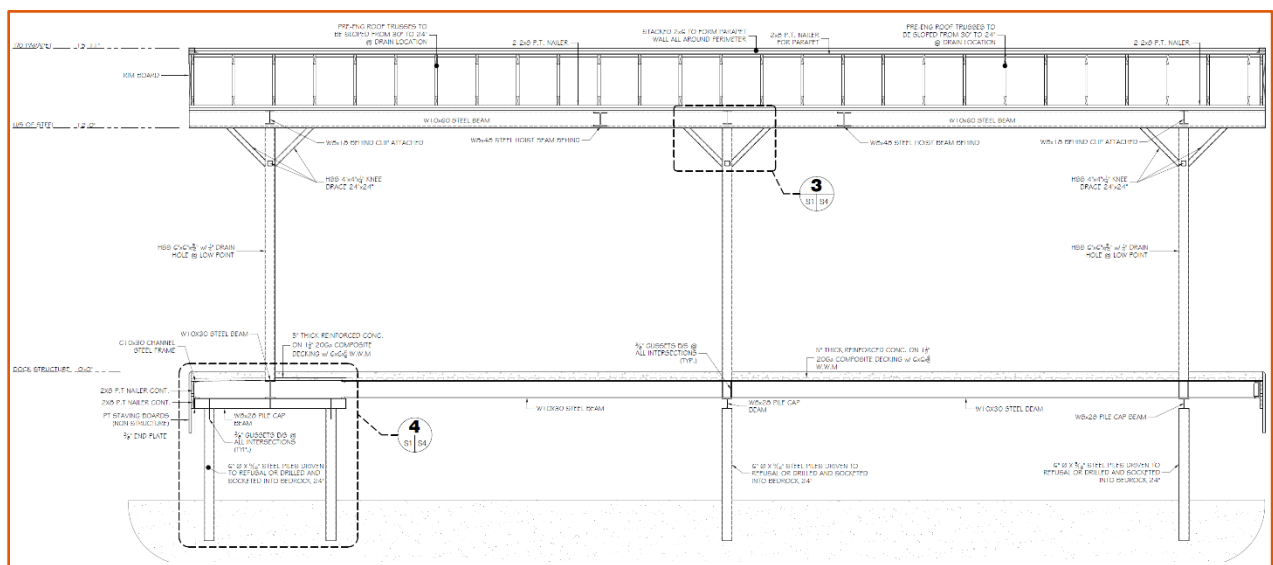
Proposed cross-section of the boathouse, Eastern Engineering Group Inc.
